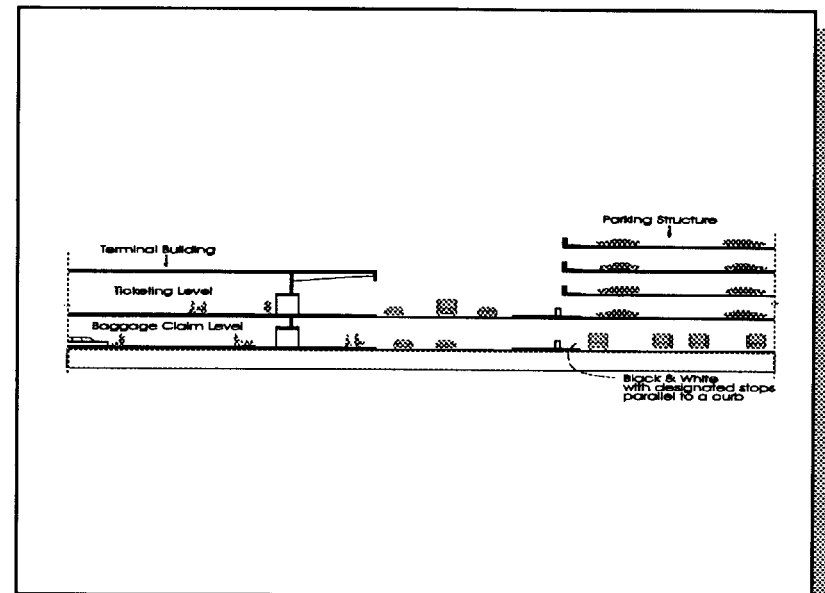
Additional Pickup Area Located in Parking Structure
